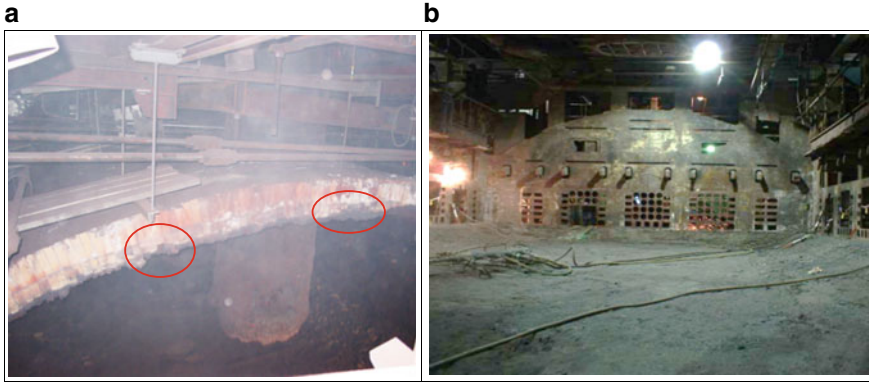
a 2004 rebuild—damaged observed in some sections of the roof, b 2004 rebuild—demolition completed
